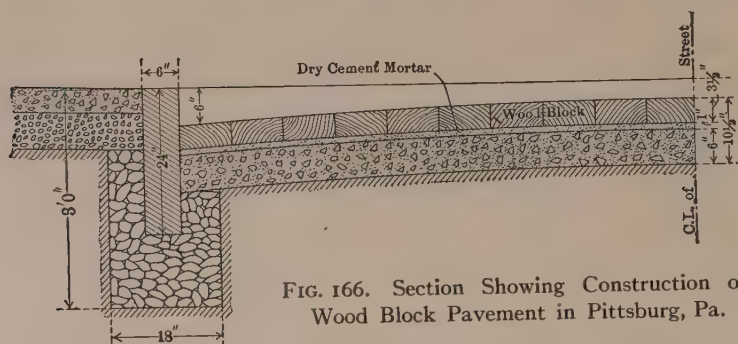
Section Showing Construction of Wood Block Pavement in Pittsburg, Pa.
